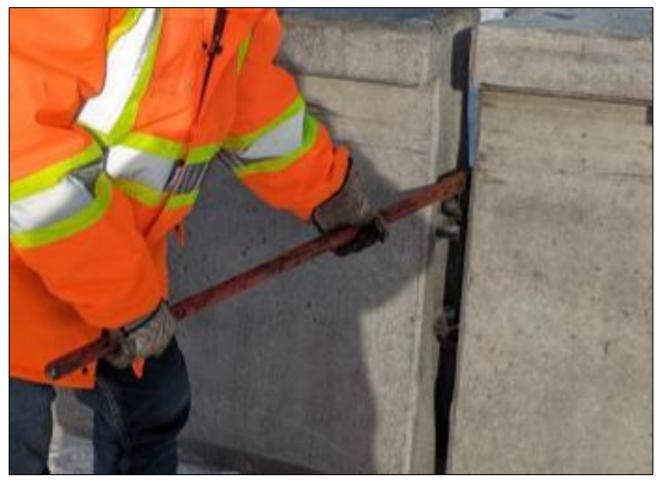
Using a Pry Bar to Adjust Barrier Alignment
